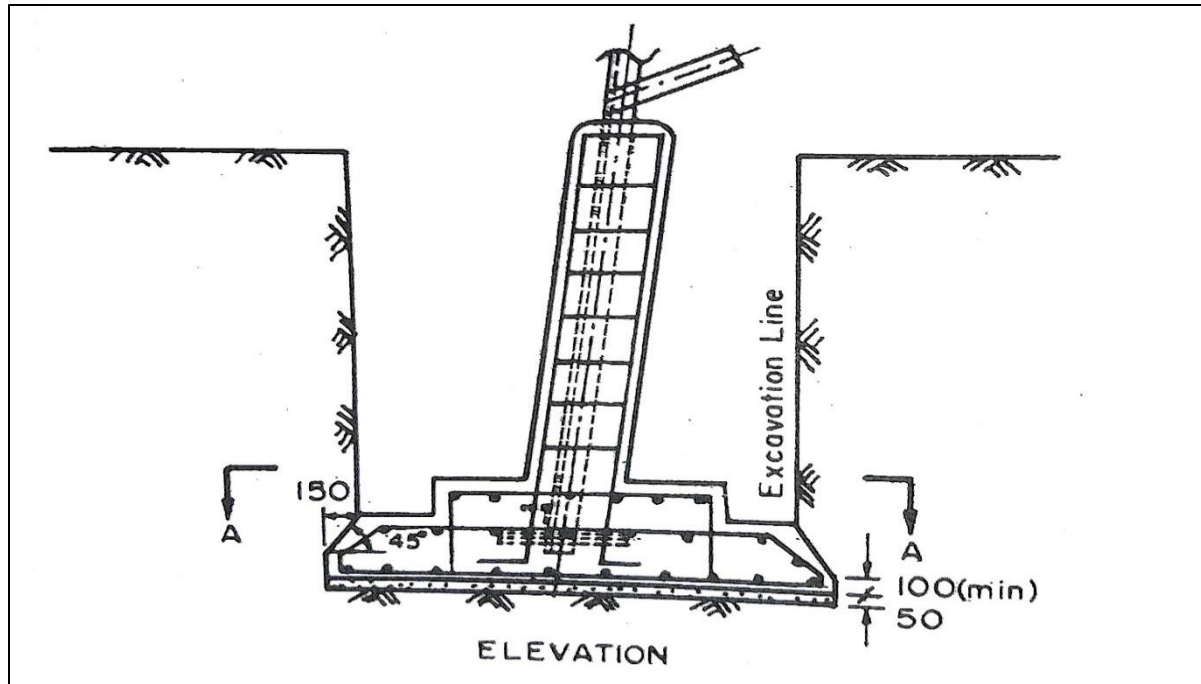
(a): Reinforced Concrete Spread Foundation (Under-cut Type)
